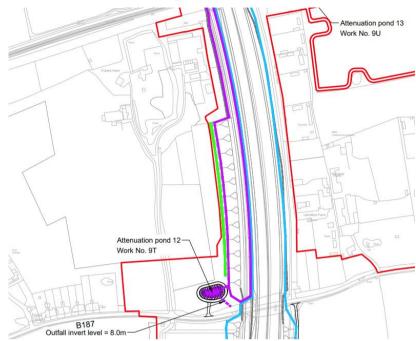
Extract from Drainage Plans Volume C, Sheet 44
